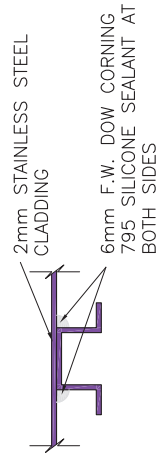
(END SUPPORT DETAILS OF STIFFENER AT CLADDING EDGE)
